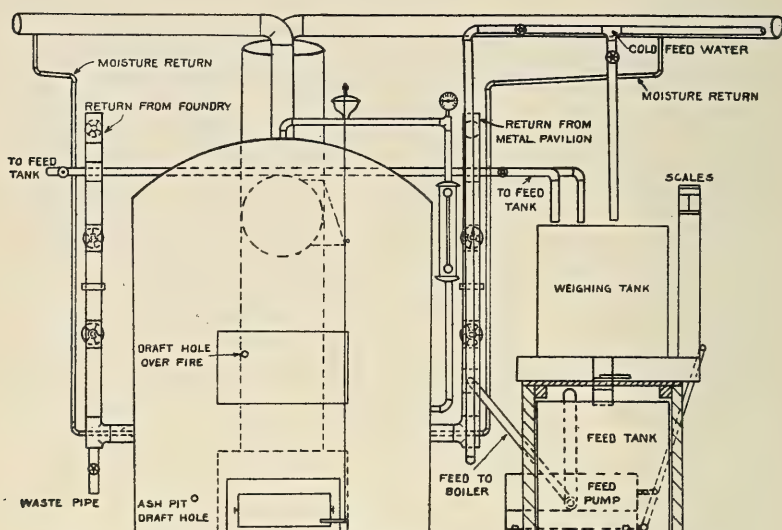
ELEVATION OF HOUSE-HEATING BOILER PLANT AT
